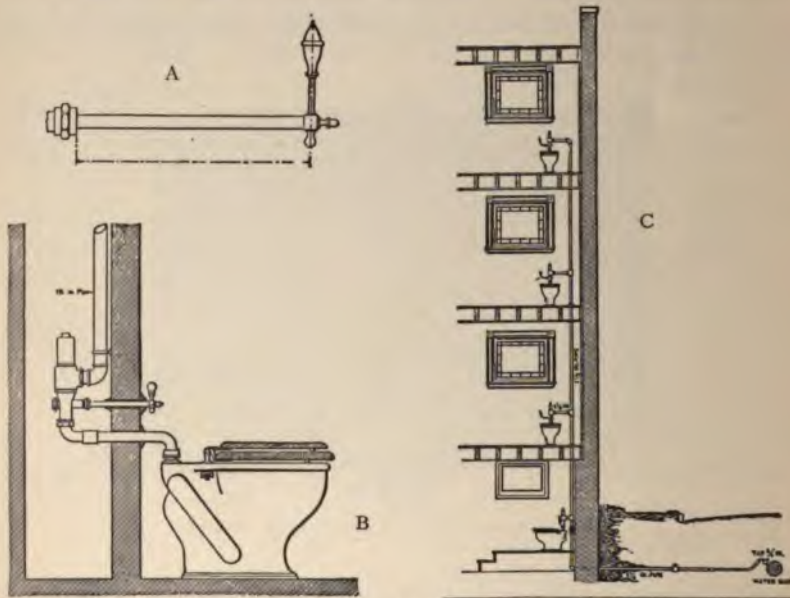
(A) FLUSHING VALVE (FLUSH VALVE, FLUSHOMETER, AQUAMETER, ETC.). (B) FLUSHING VALVE FITTED TO CLOSET. (C) SHOWING ATTACHMENT OF FLUSHING-VALVE TO SUPPLY-PIPE.
